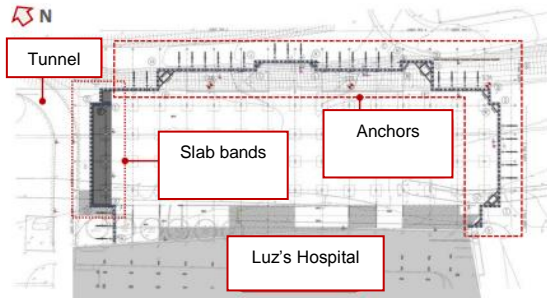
Worksite plan and the solutions adopted (Pinto *et al.*, 2014 adaptation)
